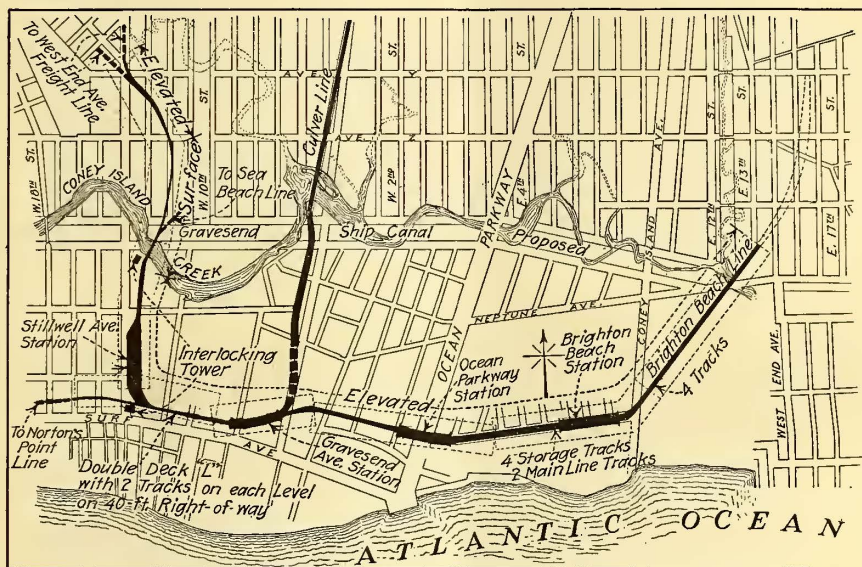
MAP SHOWING THE COMPLETE LAYOUT AND TRACK CONSTRUCTION INVOLVED IN THE TERMINAL PROJECT
